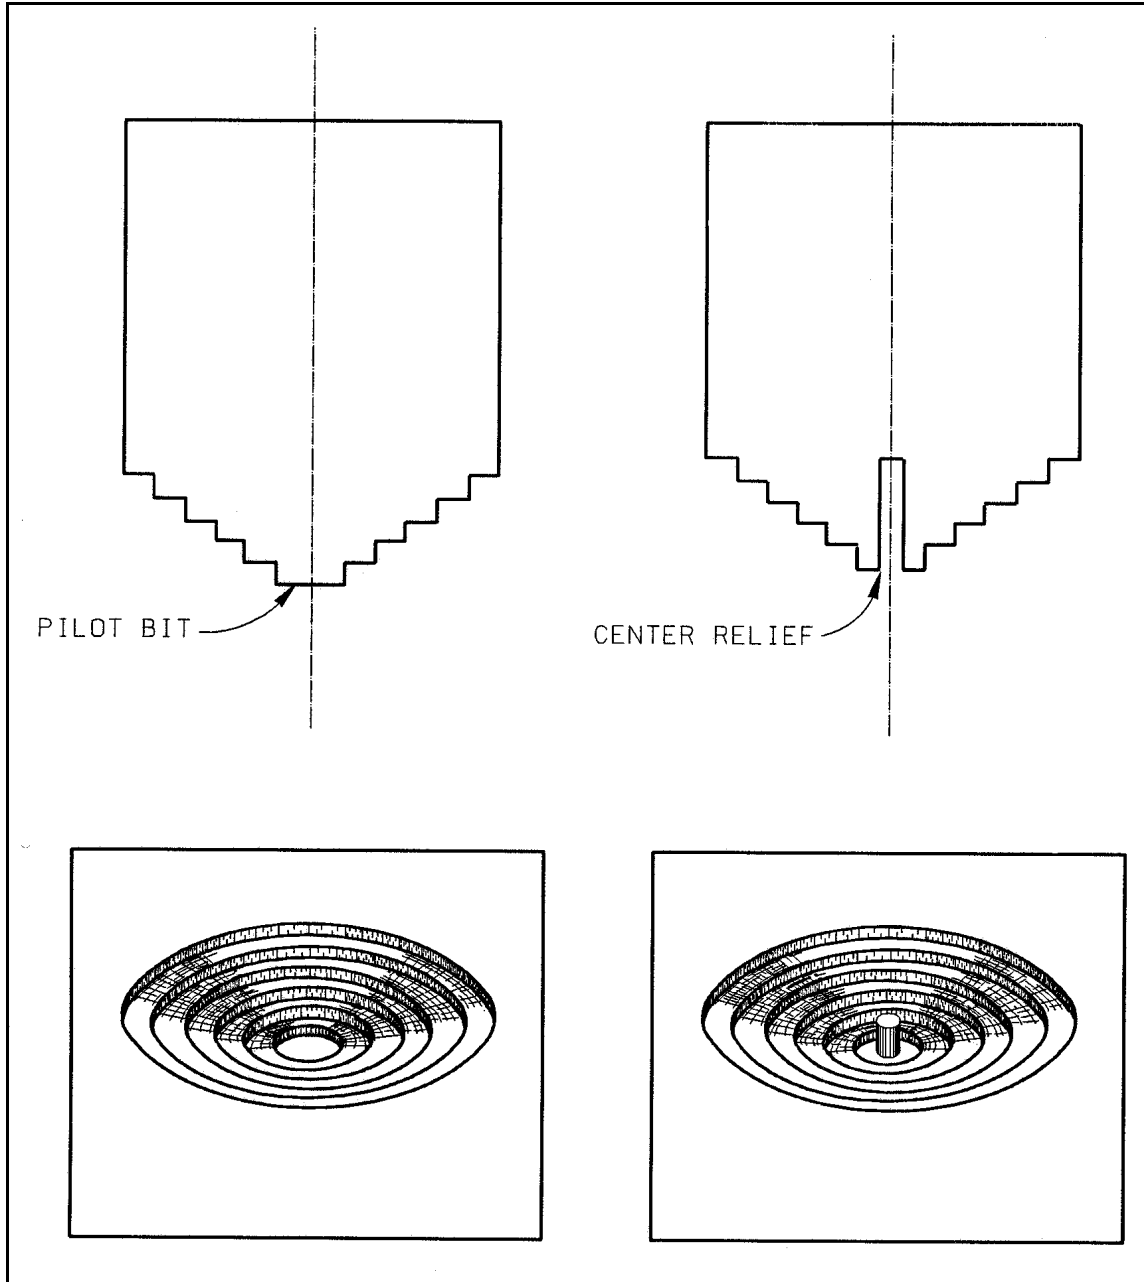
Schematic of the step configuration of the cutting teeth on a drill bit and an isometric drawing of the cut surface at the bottom of the borehole
